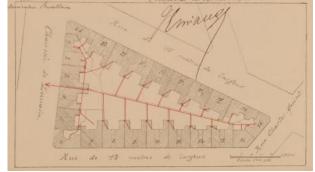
Example of the building depth: Chaussée de Louvain and the streets of Pavia, Charles and Carousel, AVB / TP 14969 (1876).
